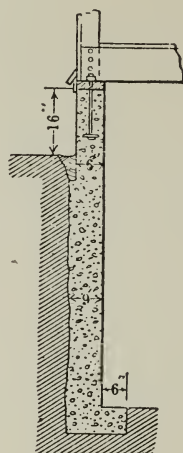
Concrete Cellar Wall. Light Building. Firm Earth. No Frost.
